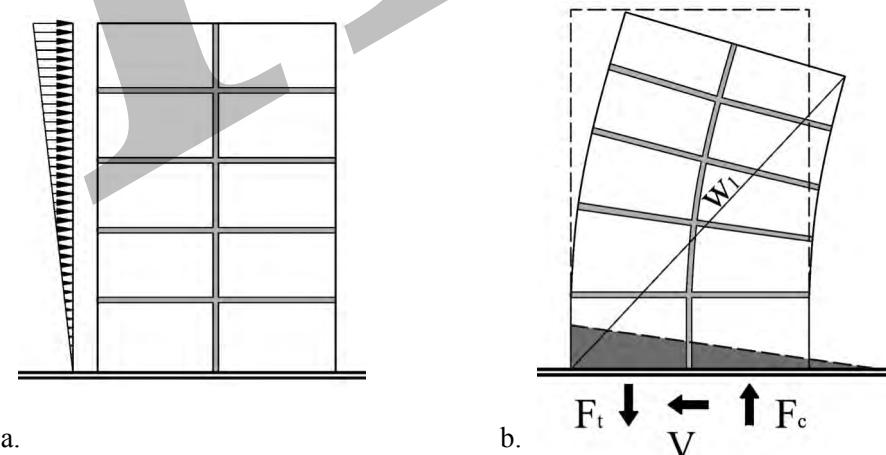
a. Large panel wall; b. Ductile behaviour on the base of the wall
